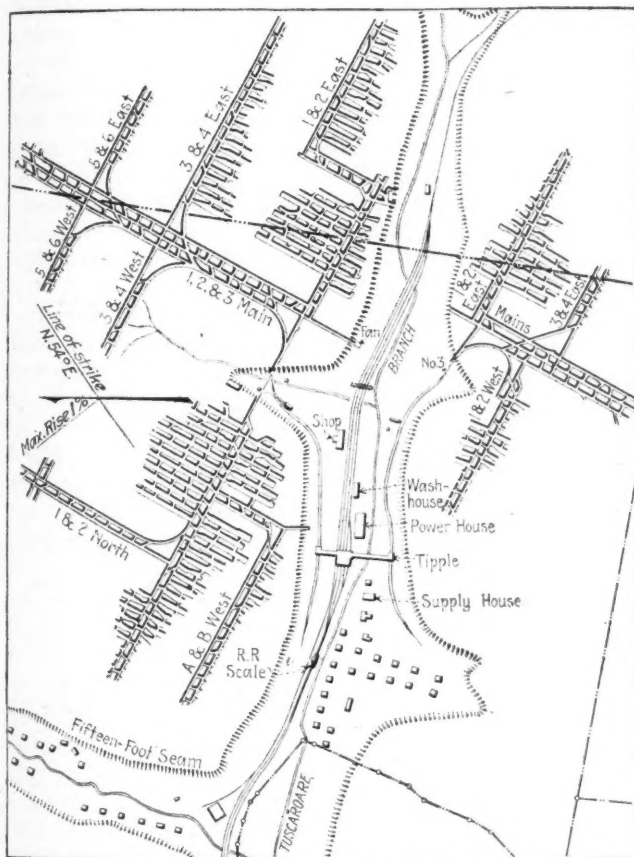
MINING PLAN AND SURFACE LAYOUT
